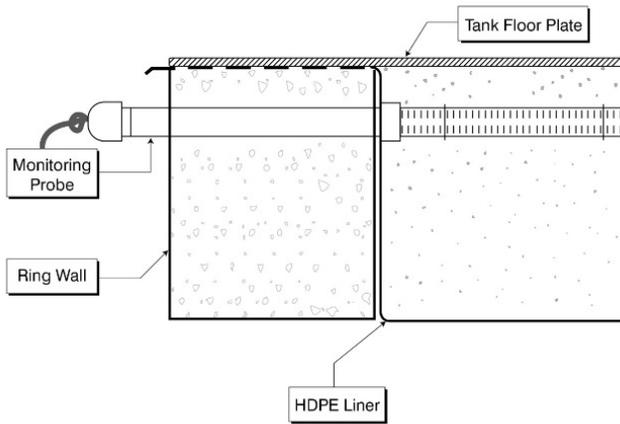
Typical ER probe installation through concrete ring wall in a single bottom tank setting on sweet sand pad
